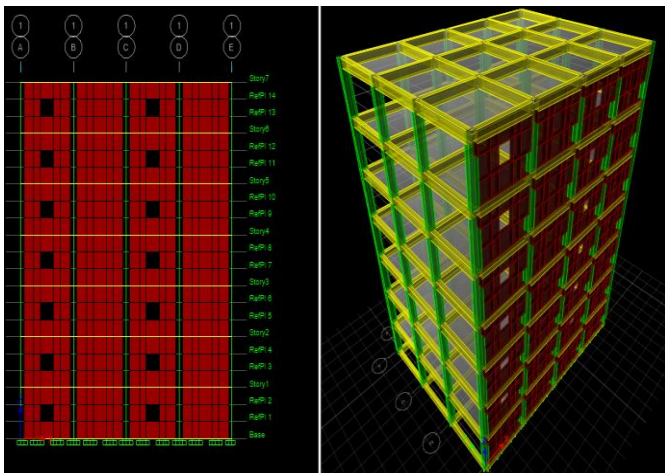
Modeling of structure with shear wall having openings arranged in vertical direction
